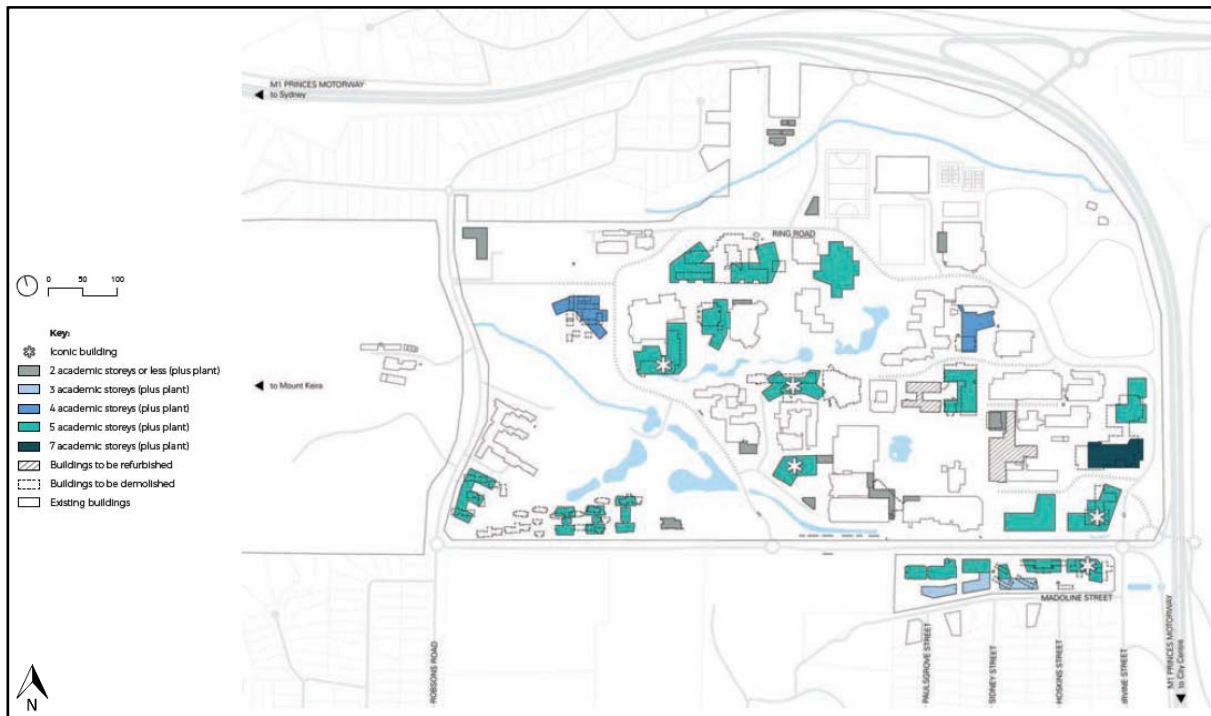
Building height requirements as per the UOW campus masterplan (source: UOW Master Plan)
